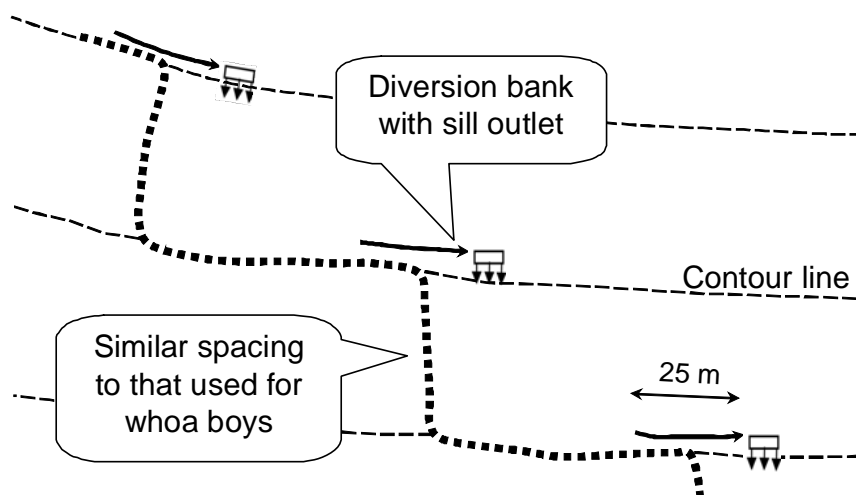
A road traversing a slope by alternating contour sections with sections directly up and down slope.
